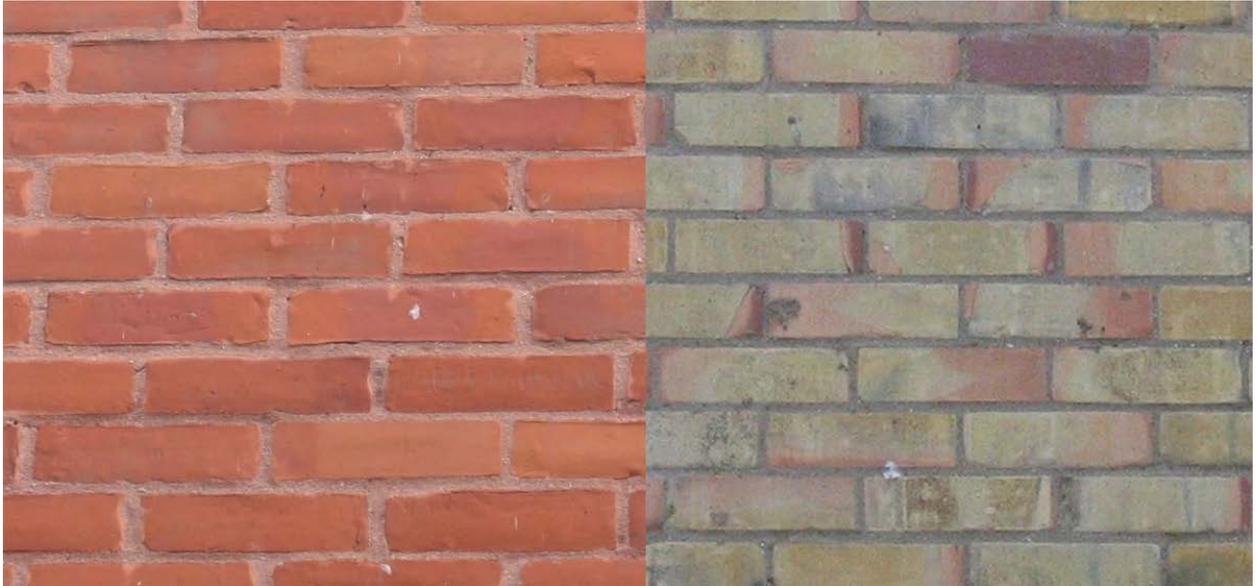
Typical Noak Bridge brickwork: Milton Hall reds with pigmented mortar, left; stock-type yellow bricks, right.
